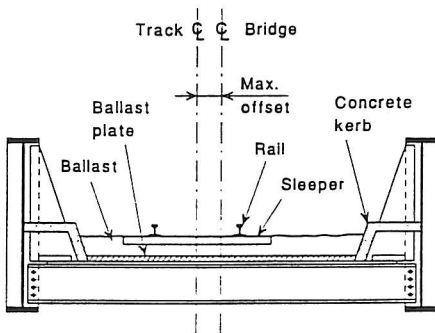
Typical section of a through-girder railroad bridge (curved track)
